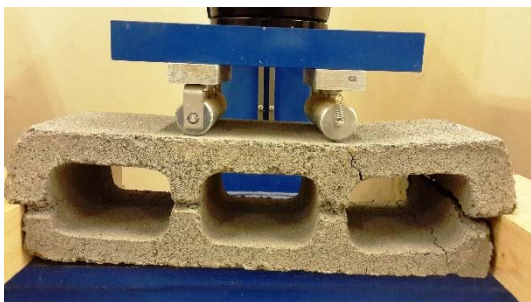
Triple-core type concrete masonry rebated filler block (small)
